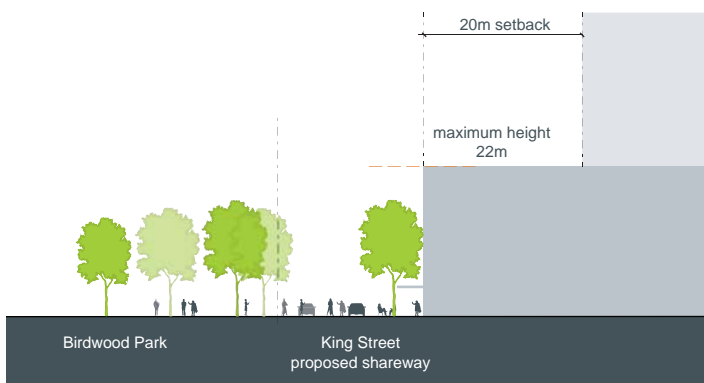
Section through buildings fronting King Street and Birdwood Park, showing 20m solar access plane setback
